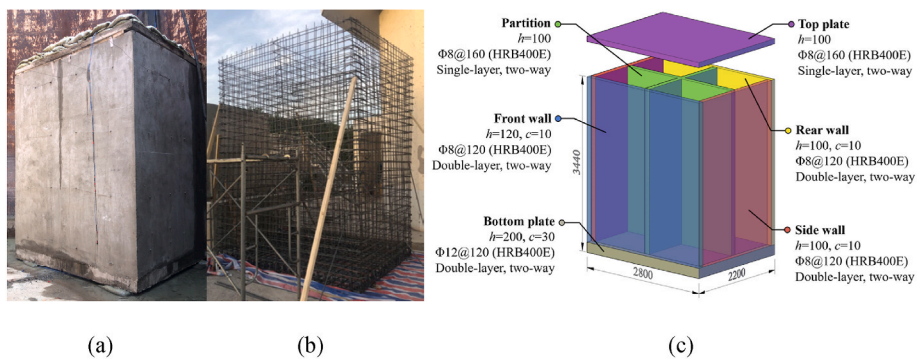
RC caisson (a) specimen (b) reinforcement cage (c) configuration and detailing (unit: mm).
